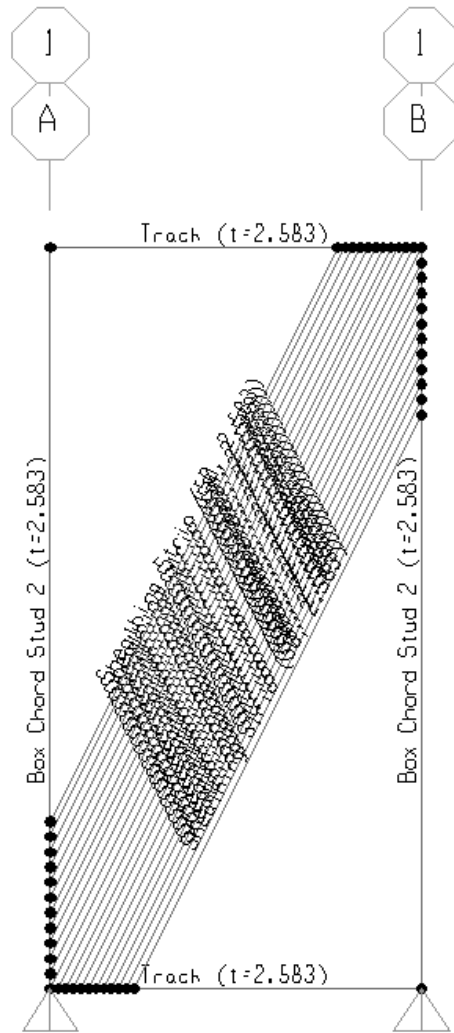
SAP2000© model of shear wall W21 with assigned frame sections.
